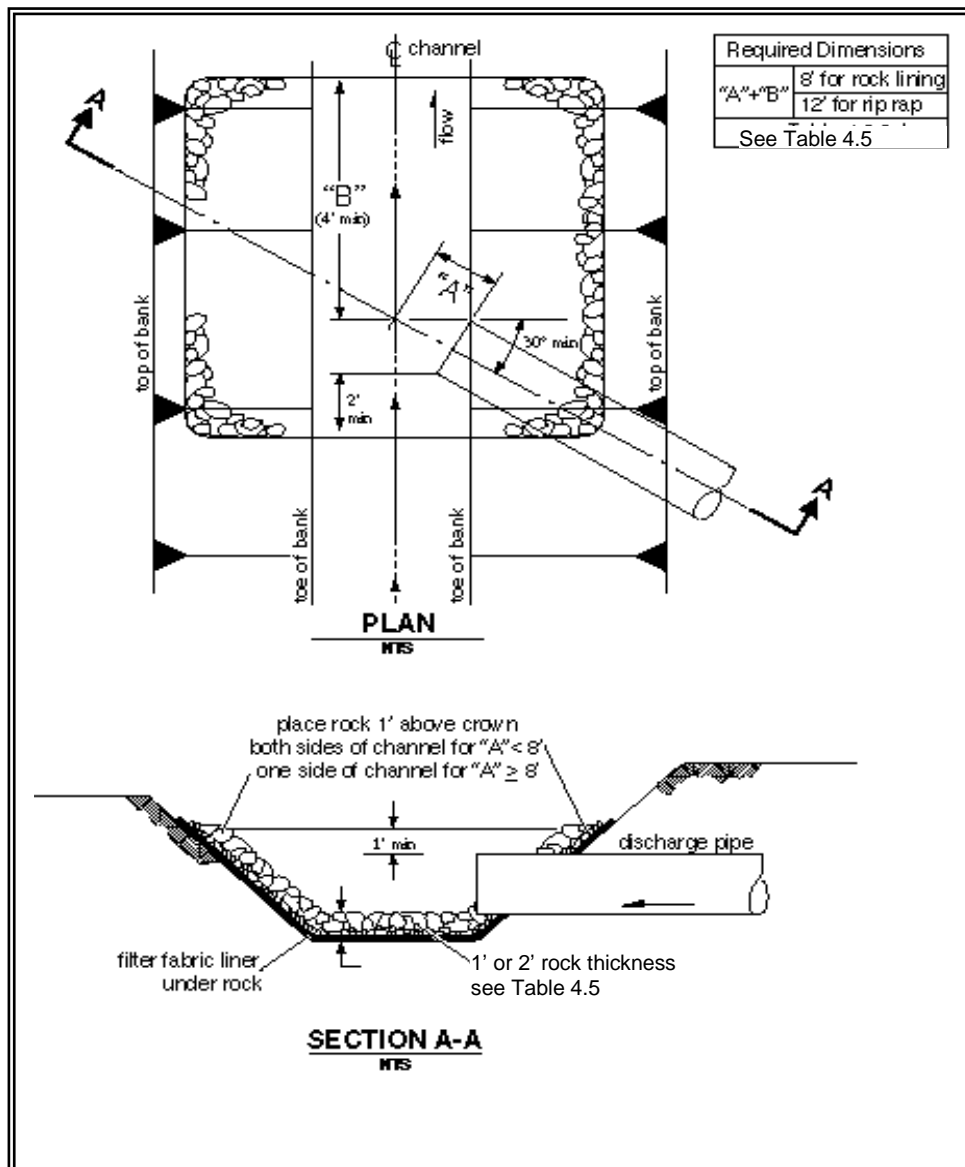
Pipe/Culvert Outfall Discharge Protection
